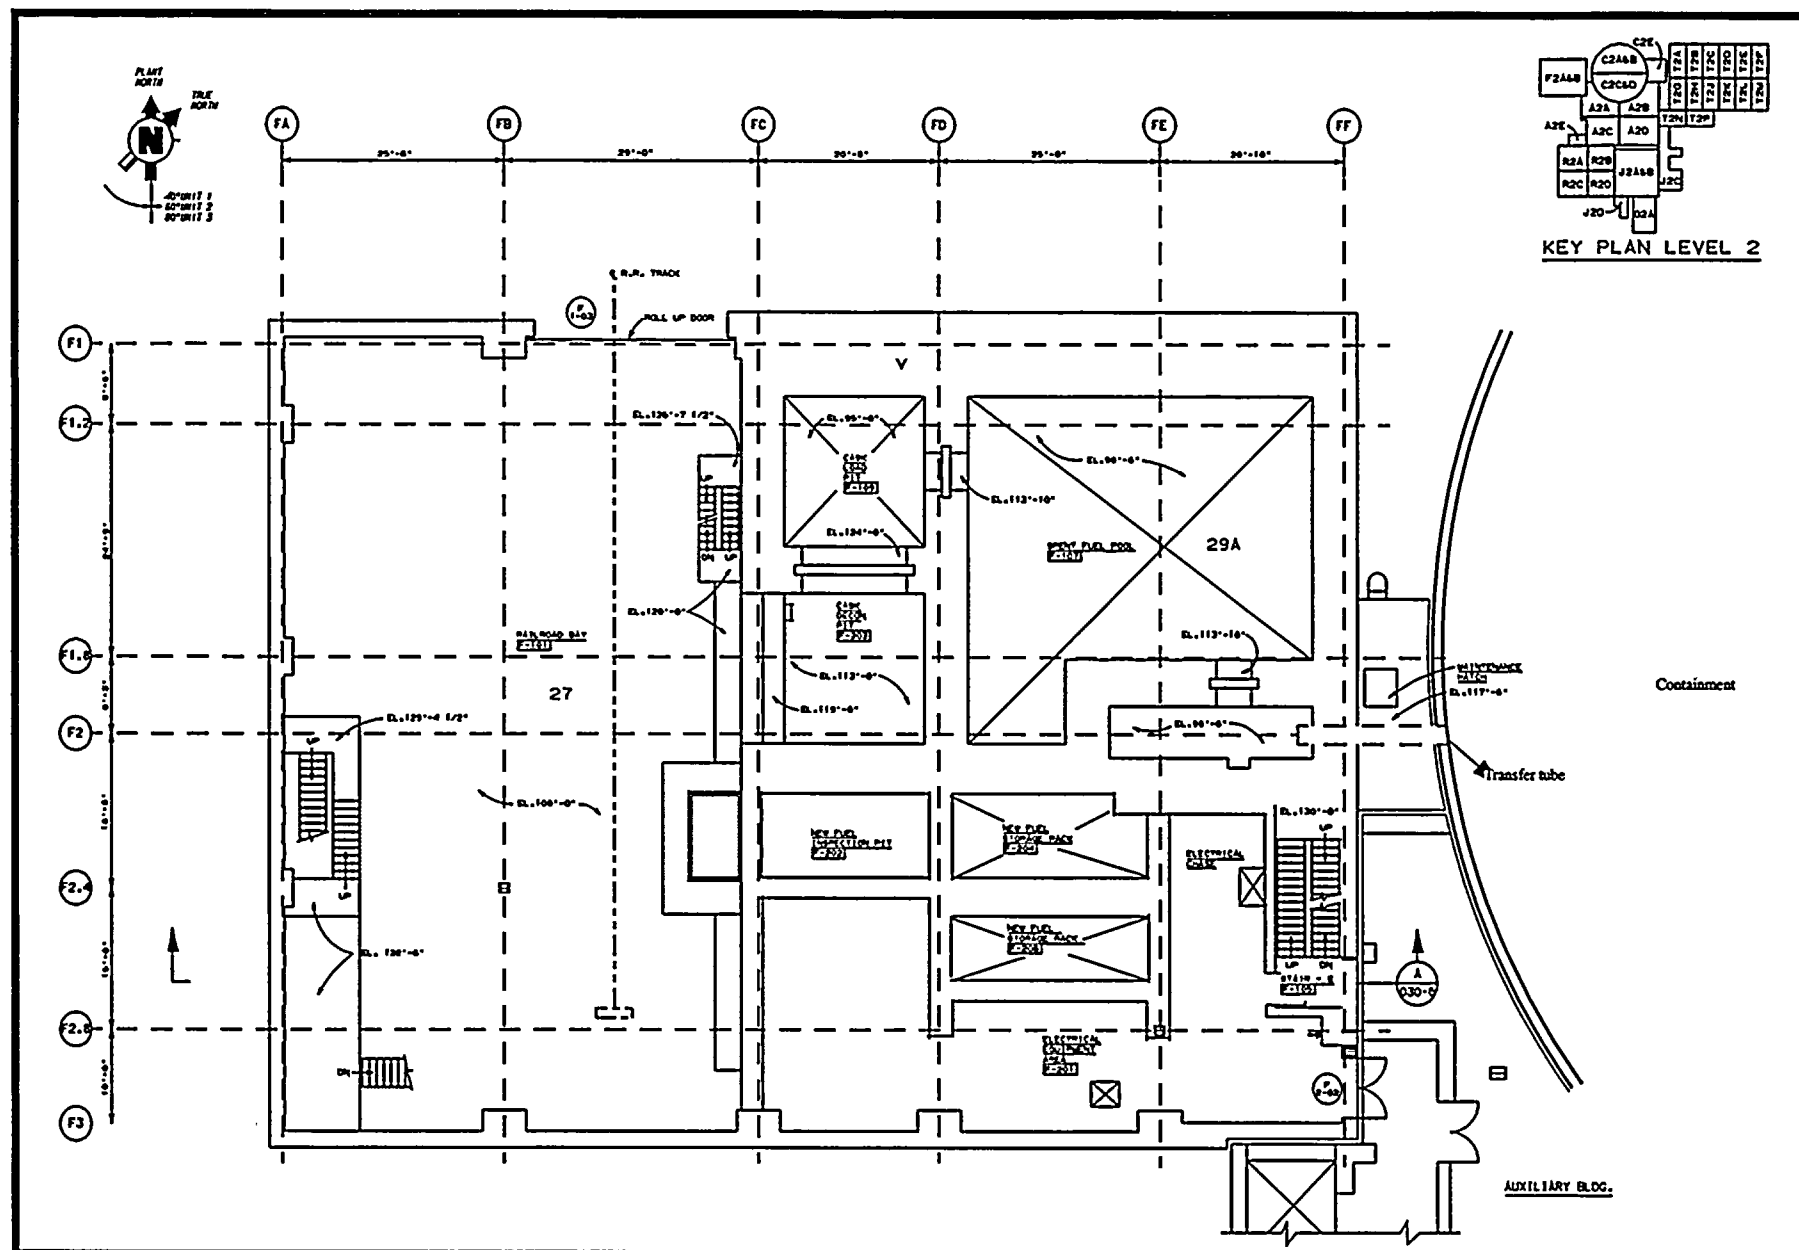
Fuel Building arrangement at plan elev. 120 ft.
